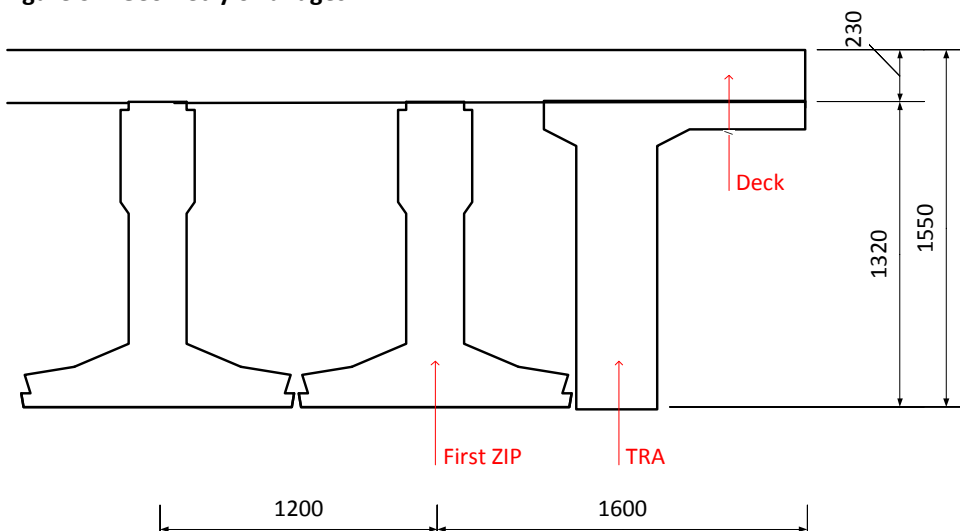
Cross-section edge of bridge (simplified height of deck)
